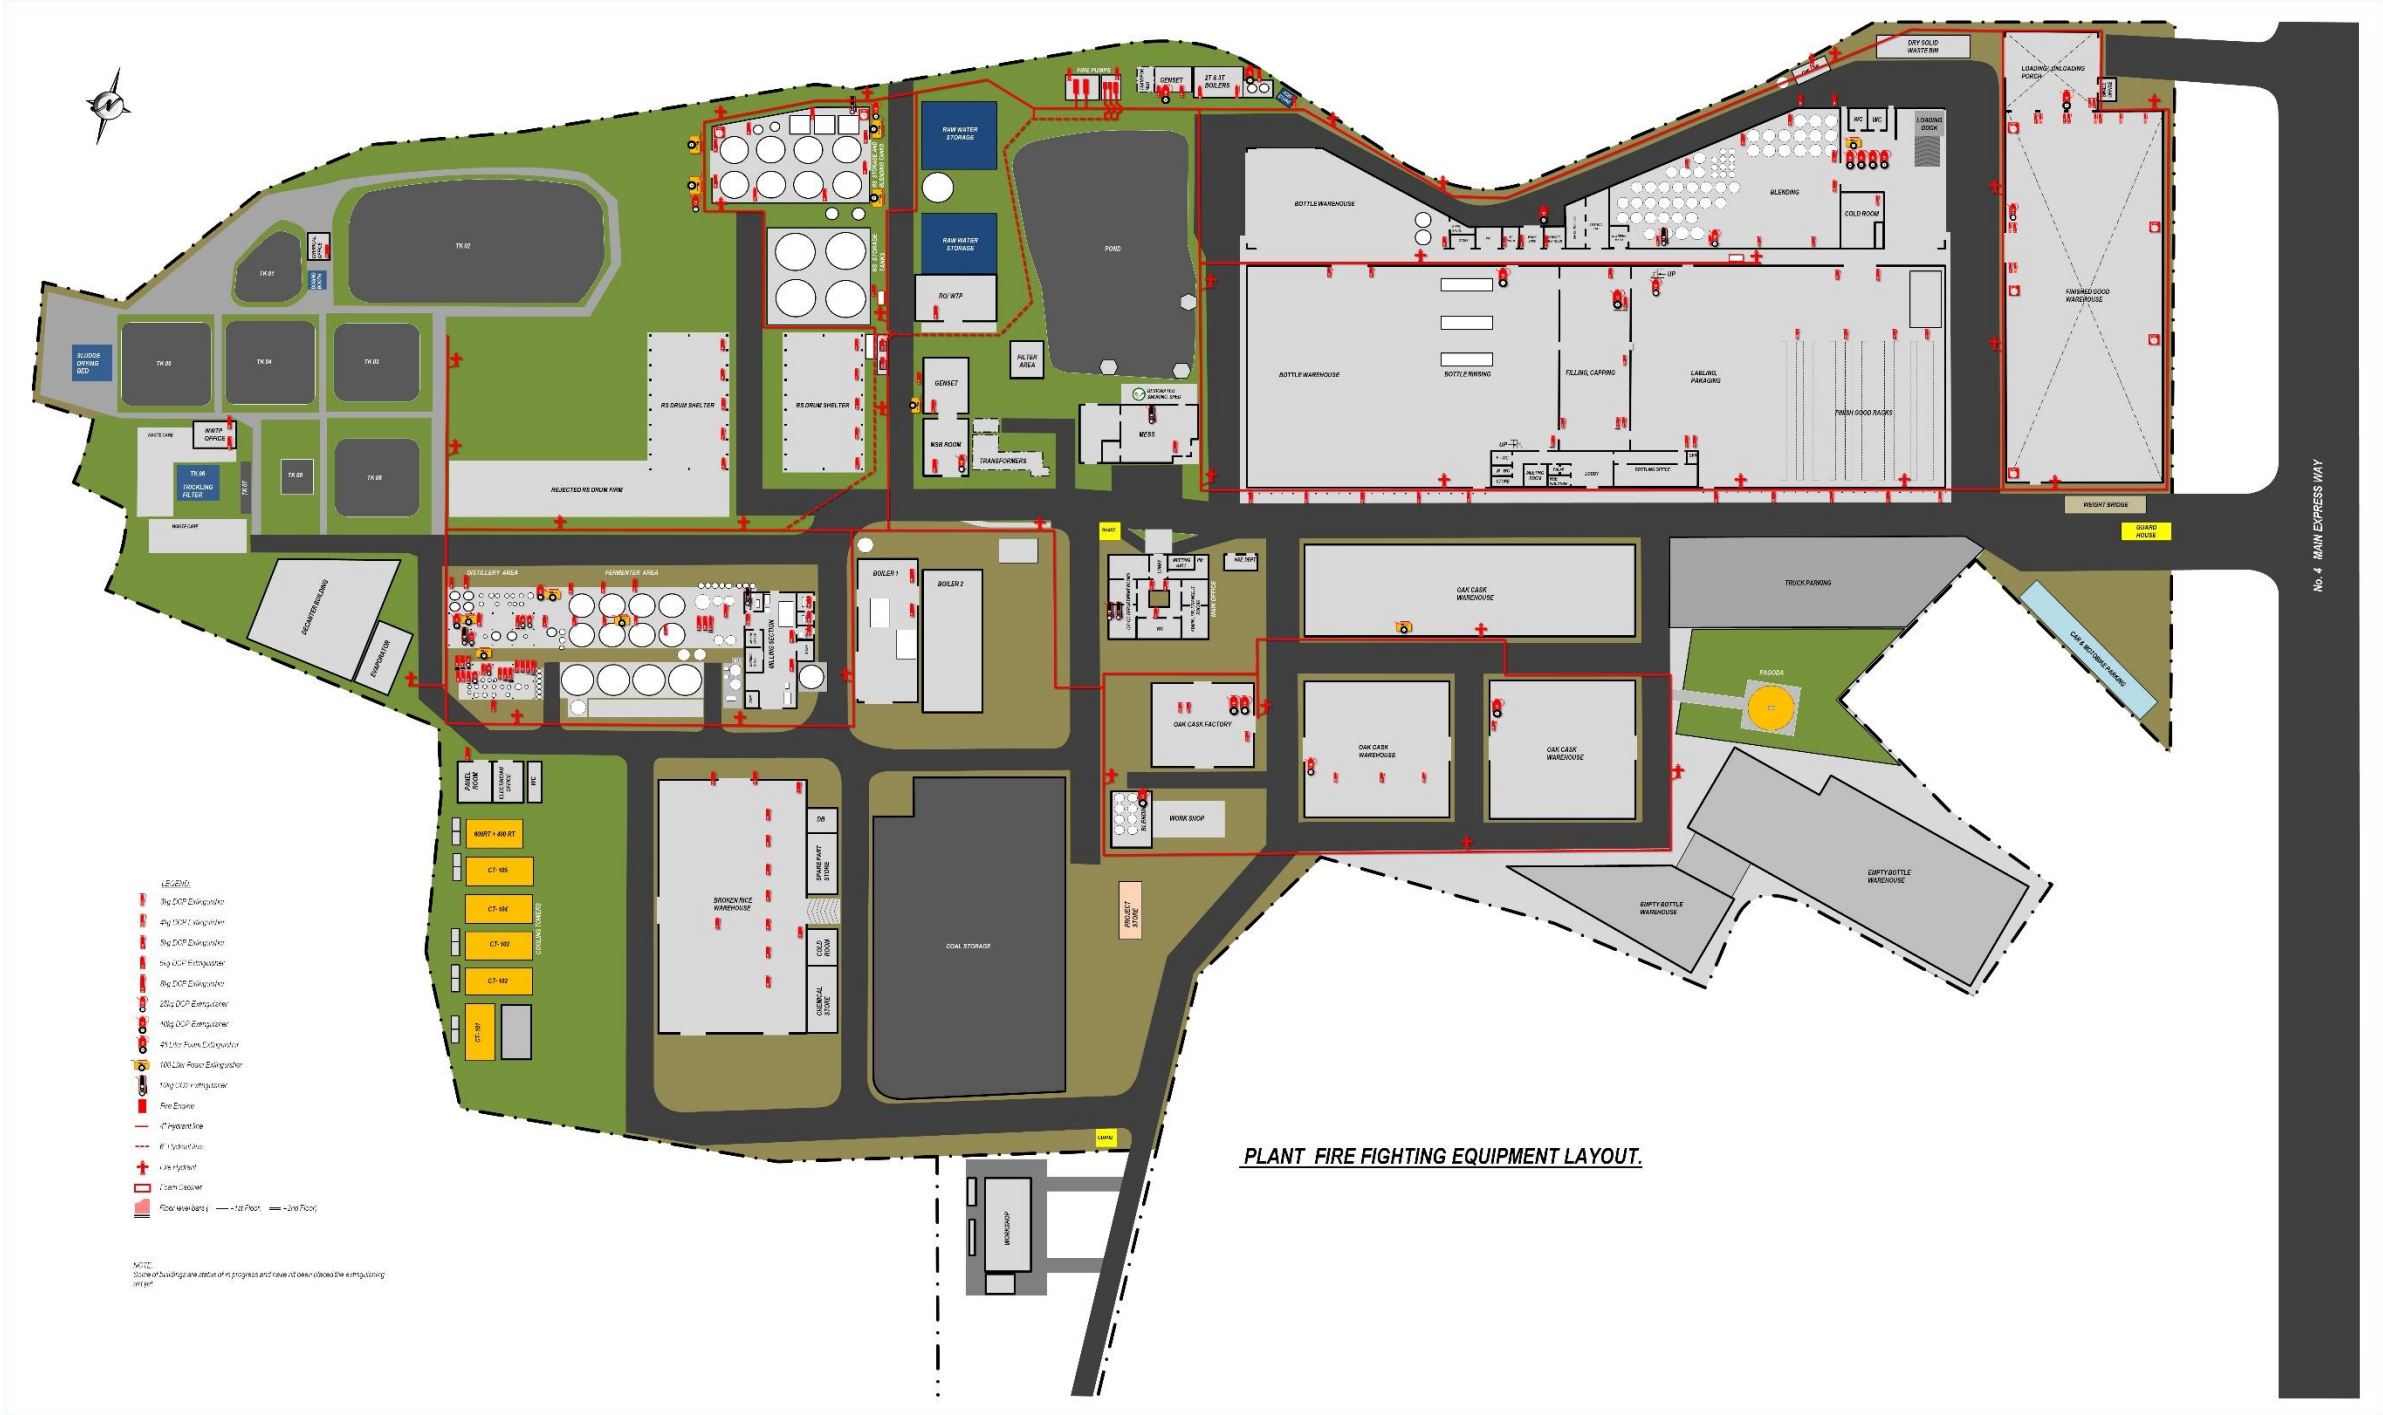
Plant Firefighting Equipment Layout of GRGICL
